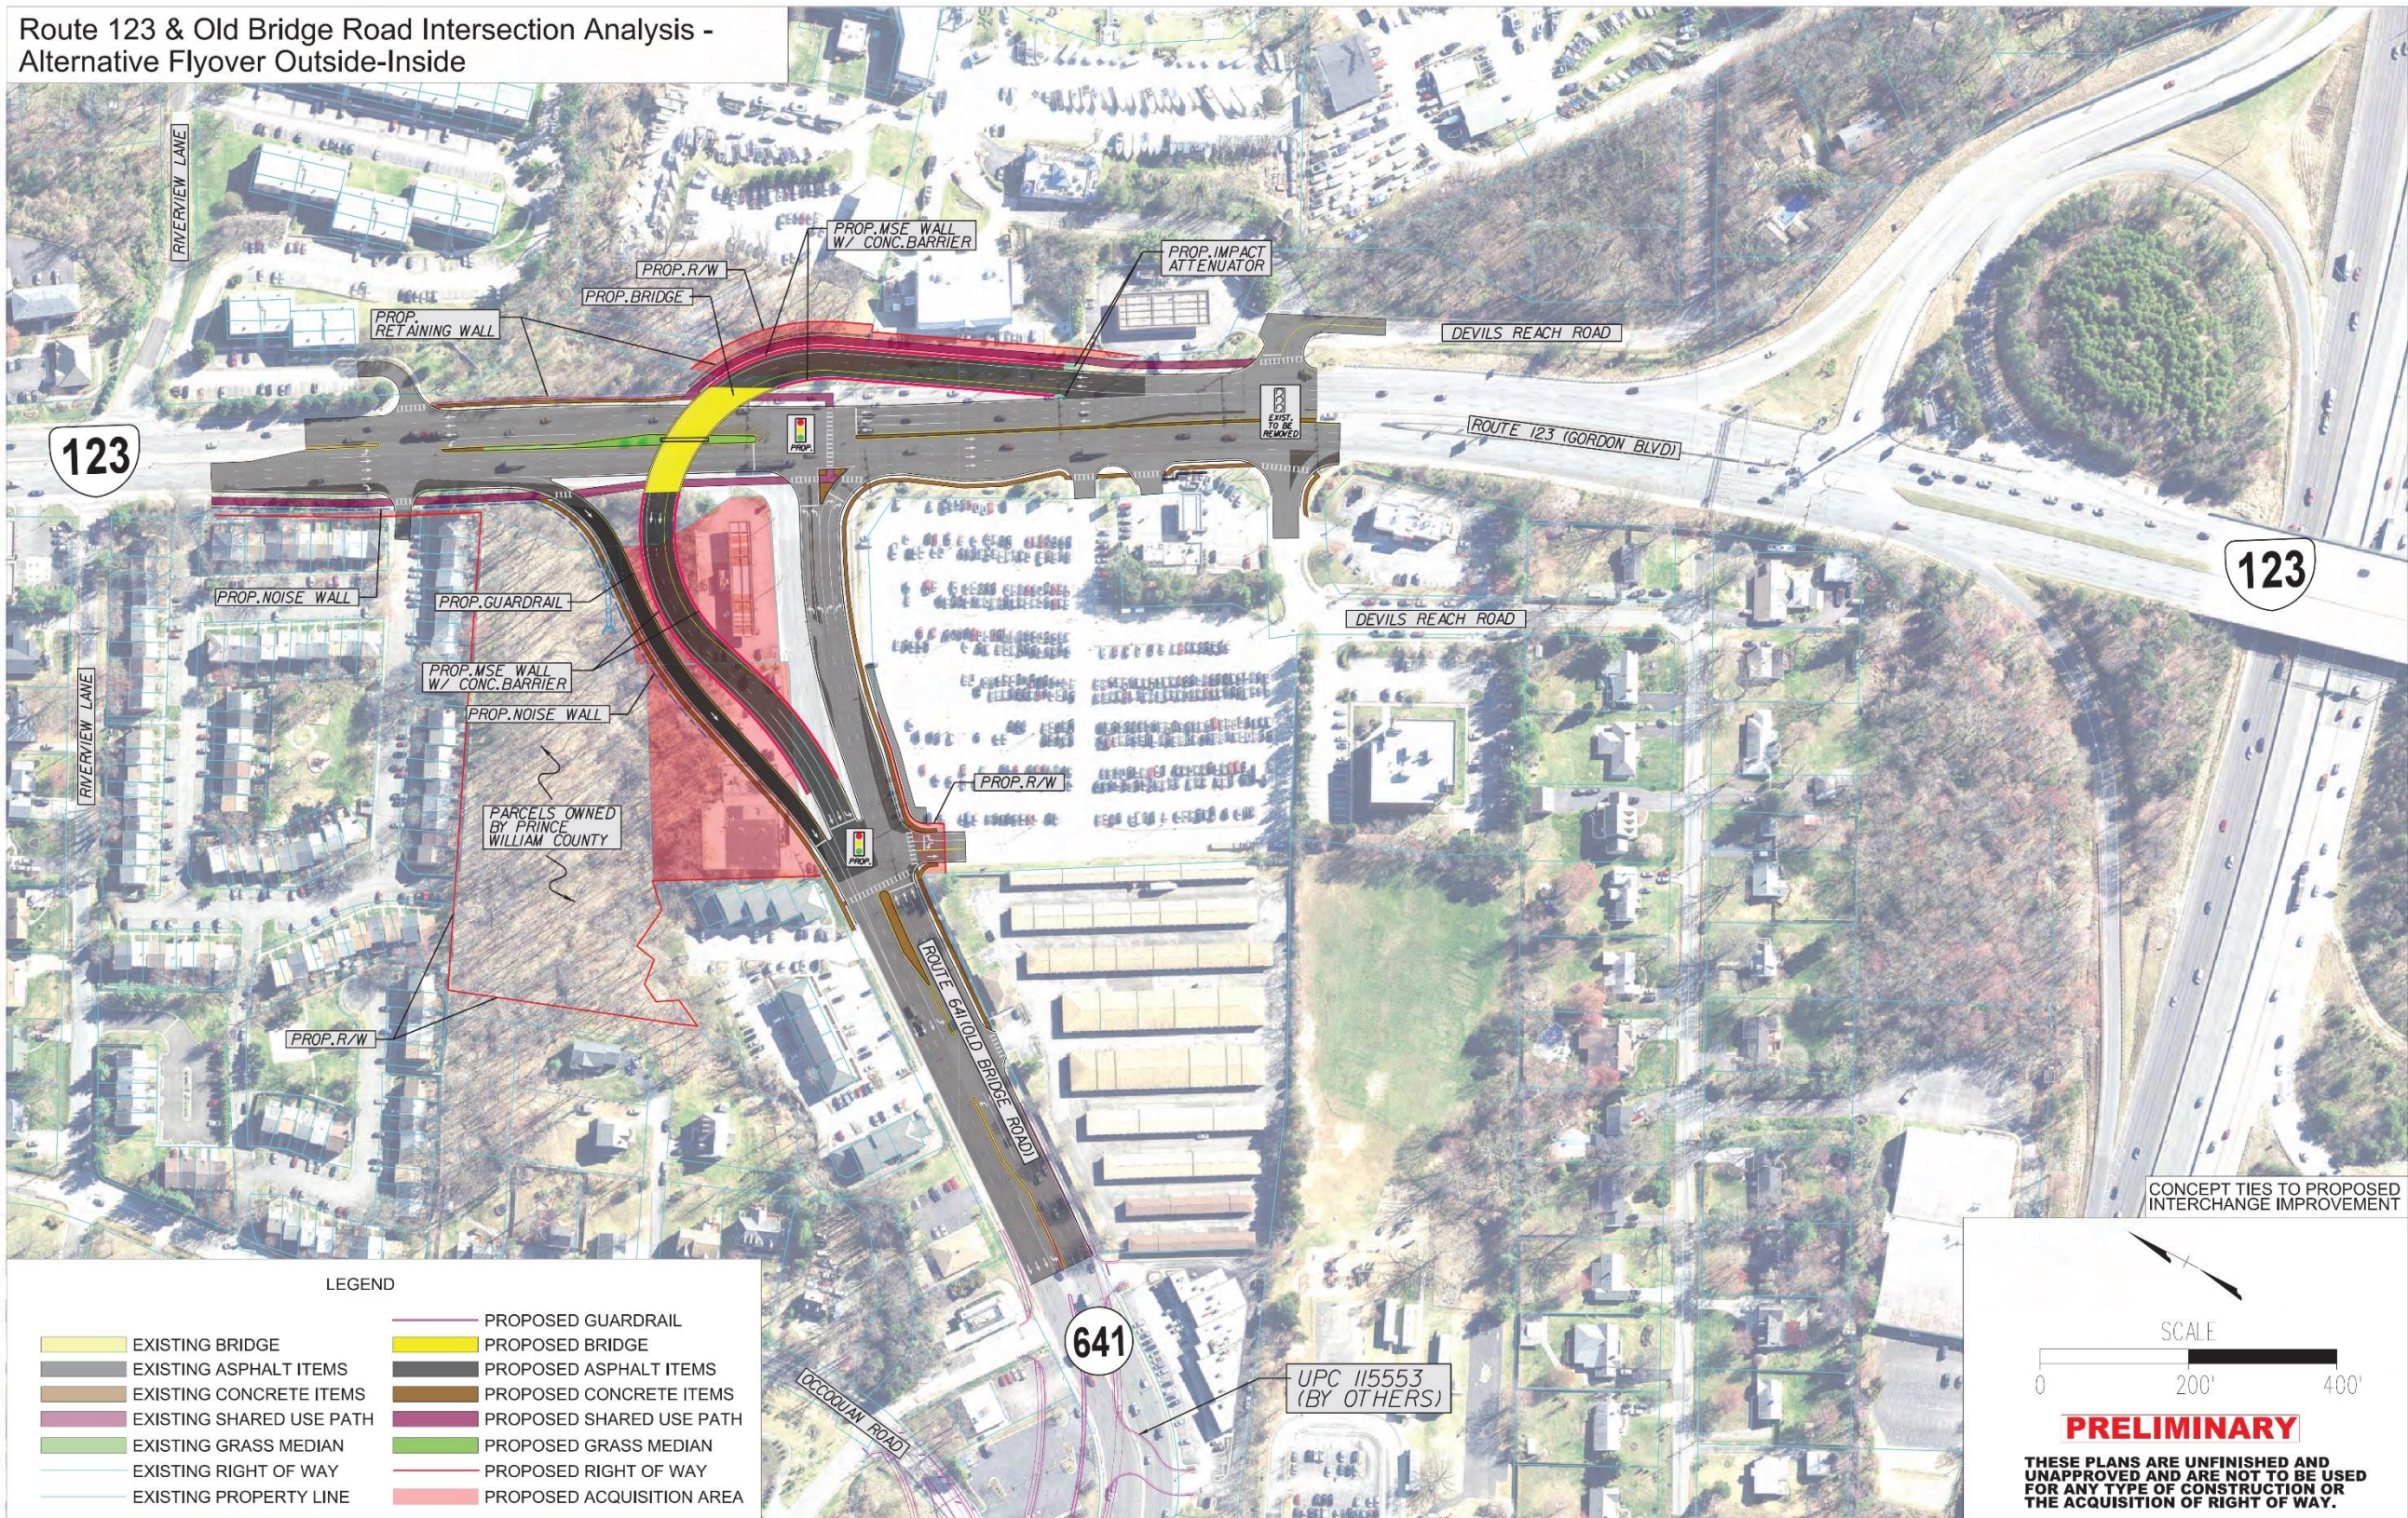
Old Bridge Road Improvement Alternative – Grade-Separated
